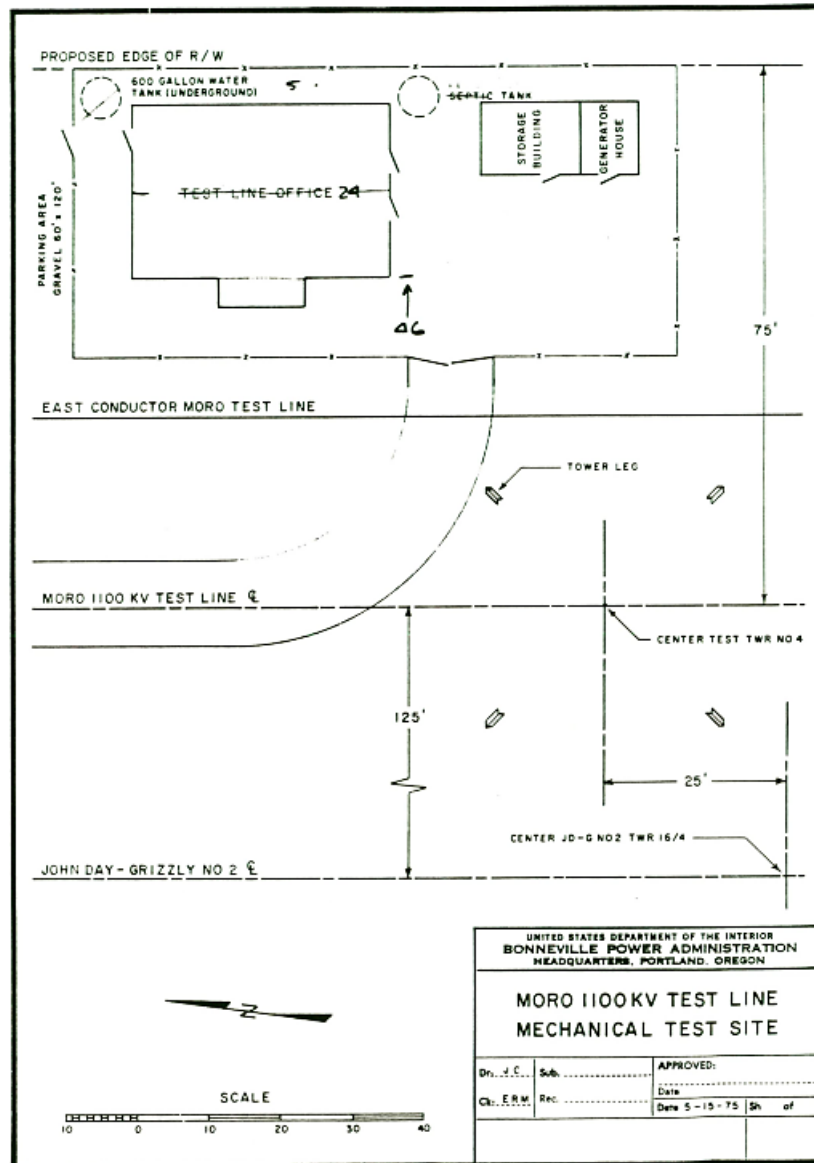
Moro Mechanical Test Facility Site Plan, 1975.<sup>220</sup>
